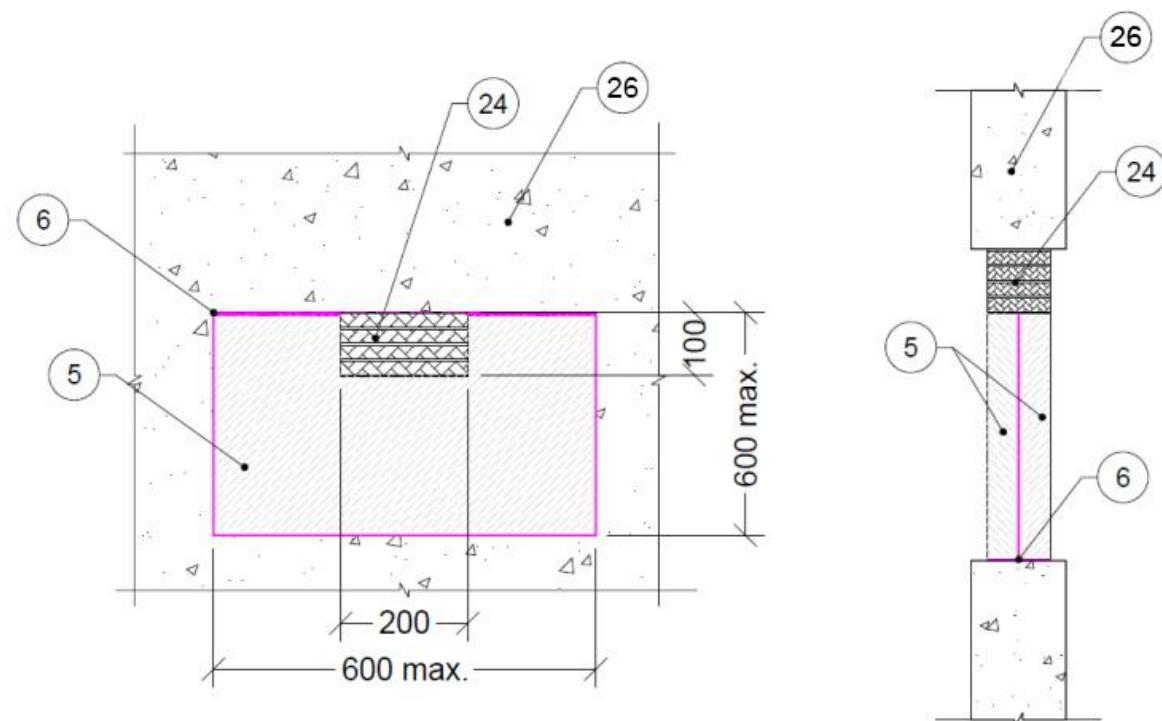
Section View of D1 & D2 Cables with Cable Trays Installed against Floor Construction in Vertical Substrates
